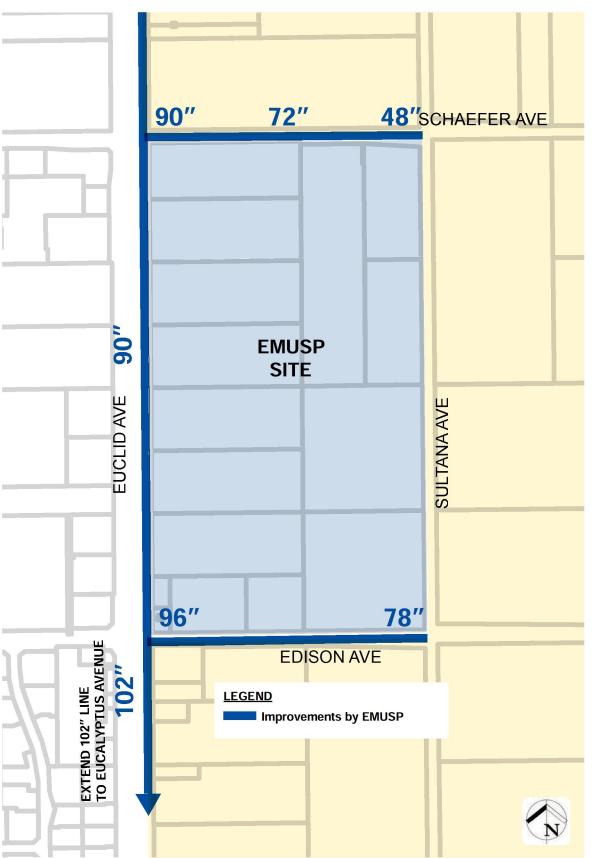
SPECIFIC PLAN STORM DRAIN PLAN
